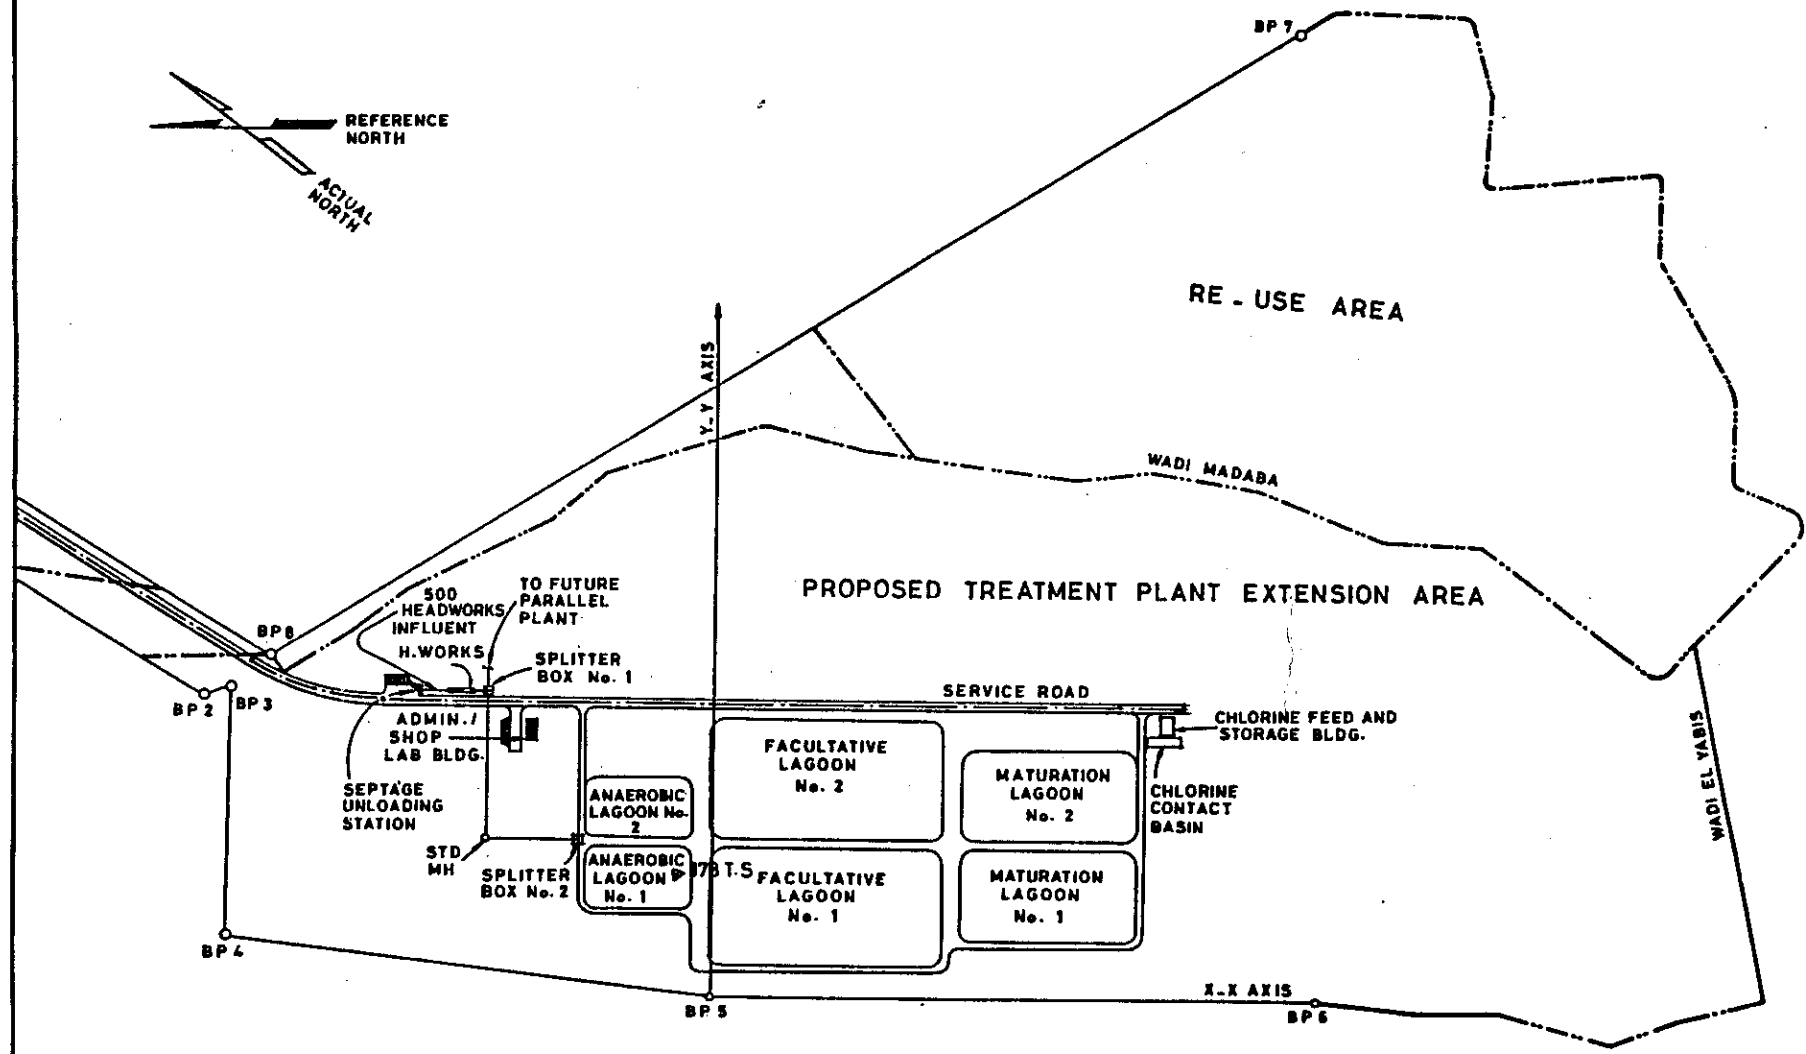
Schematic Layout of Existing Wastewater Treatment Plant - MADABA
